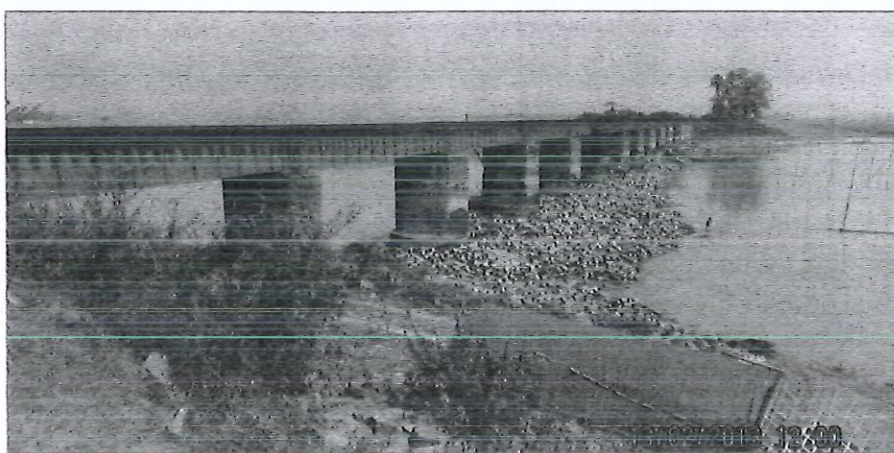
Longest Bridge No. 25 in Beel Area showing Pier Protection and Slope Protection Works
